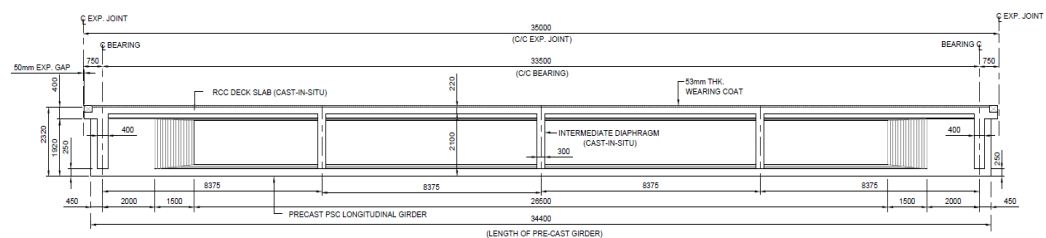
9 Elevation of 35m span OC post tensioned I girder
